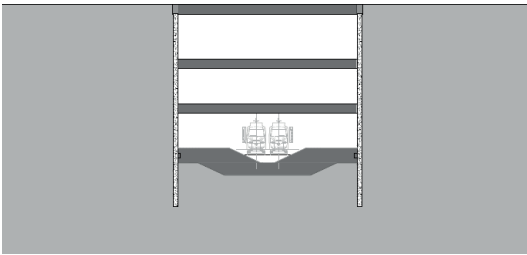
Schematic of Phase Six - Final Earthwork and Concrete Pouring of the Station Floor Slab
